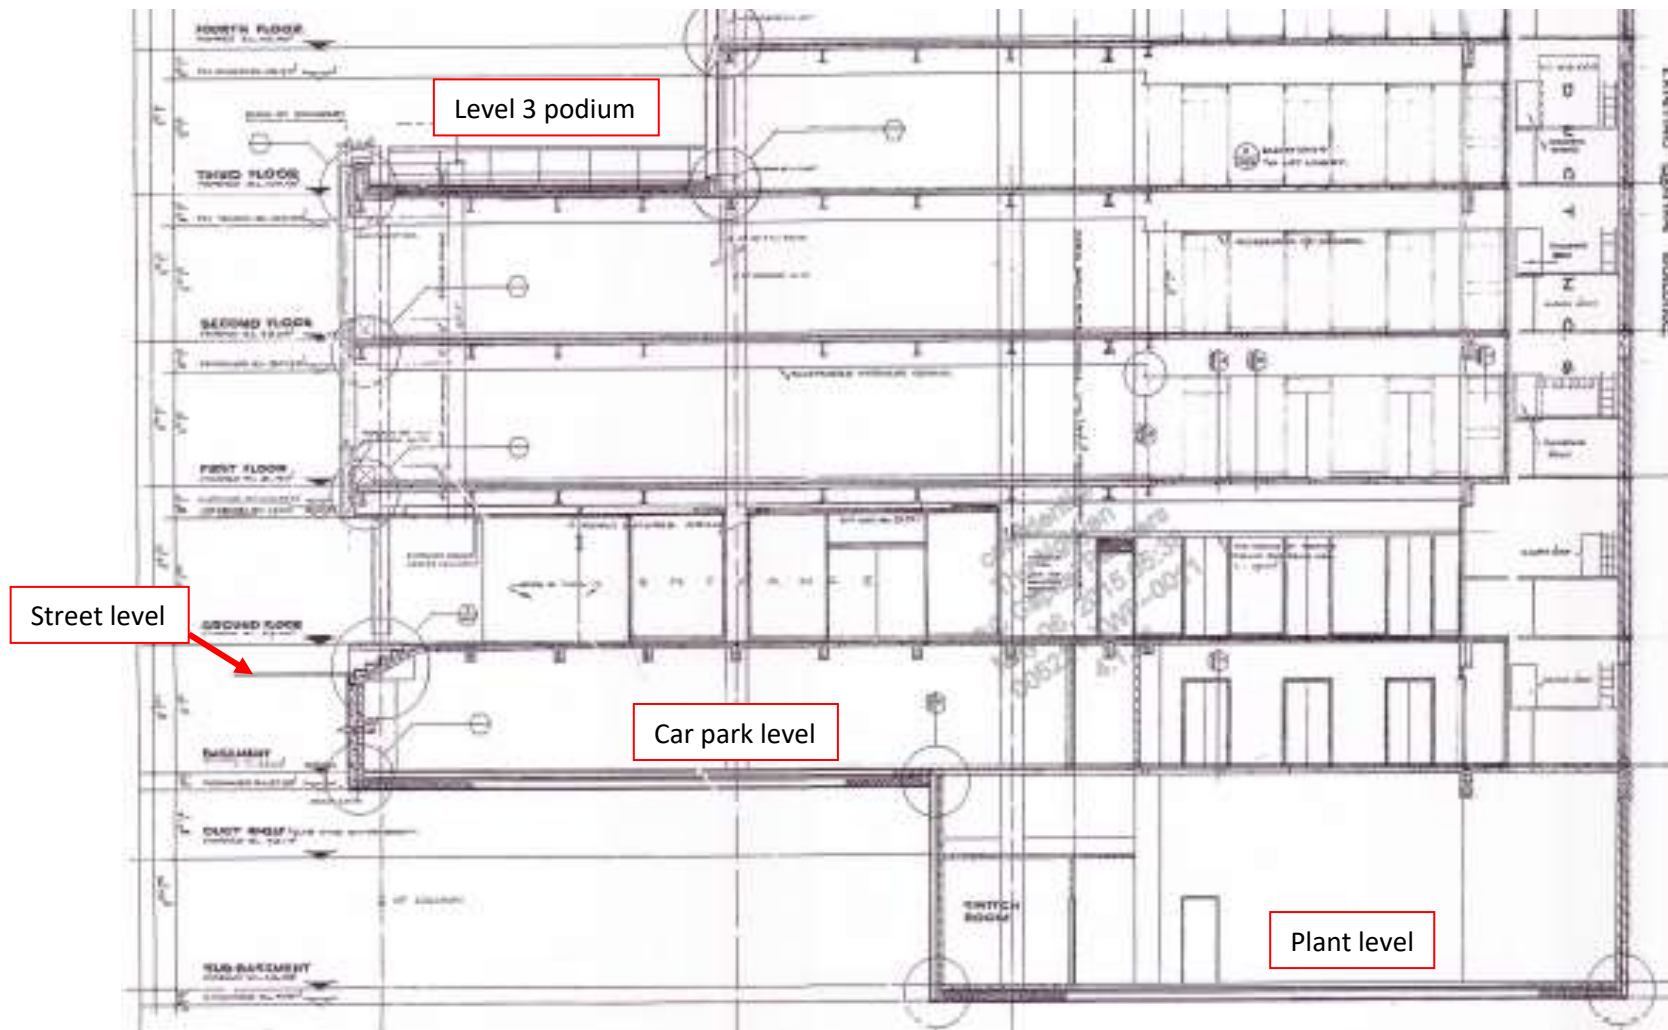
Section plan showing ground and below ground levels (Peddle Thorp & Walker section through centre plan 622/33A 1963)
